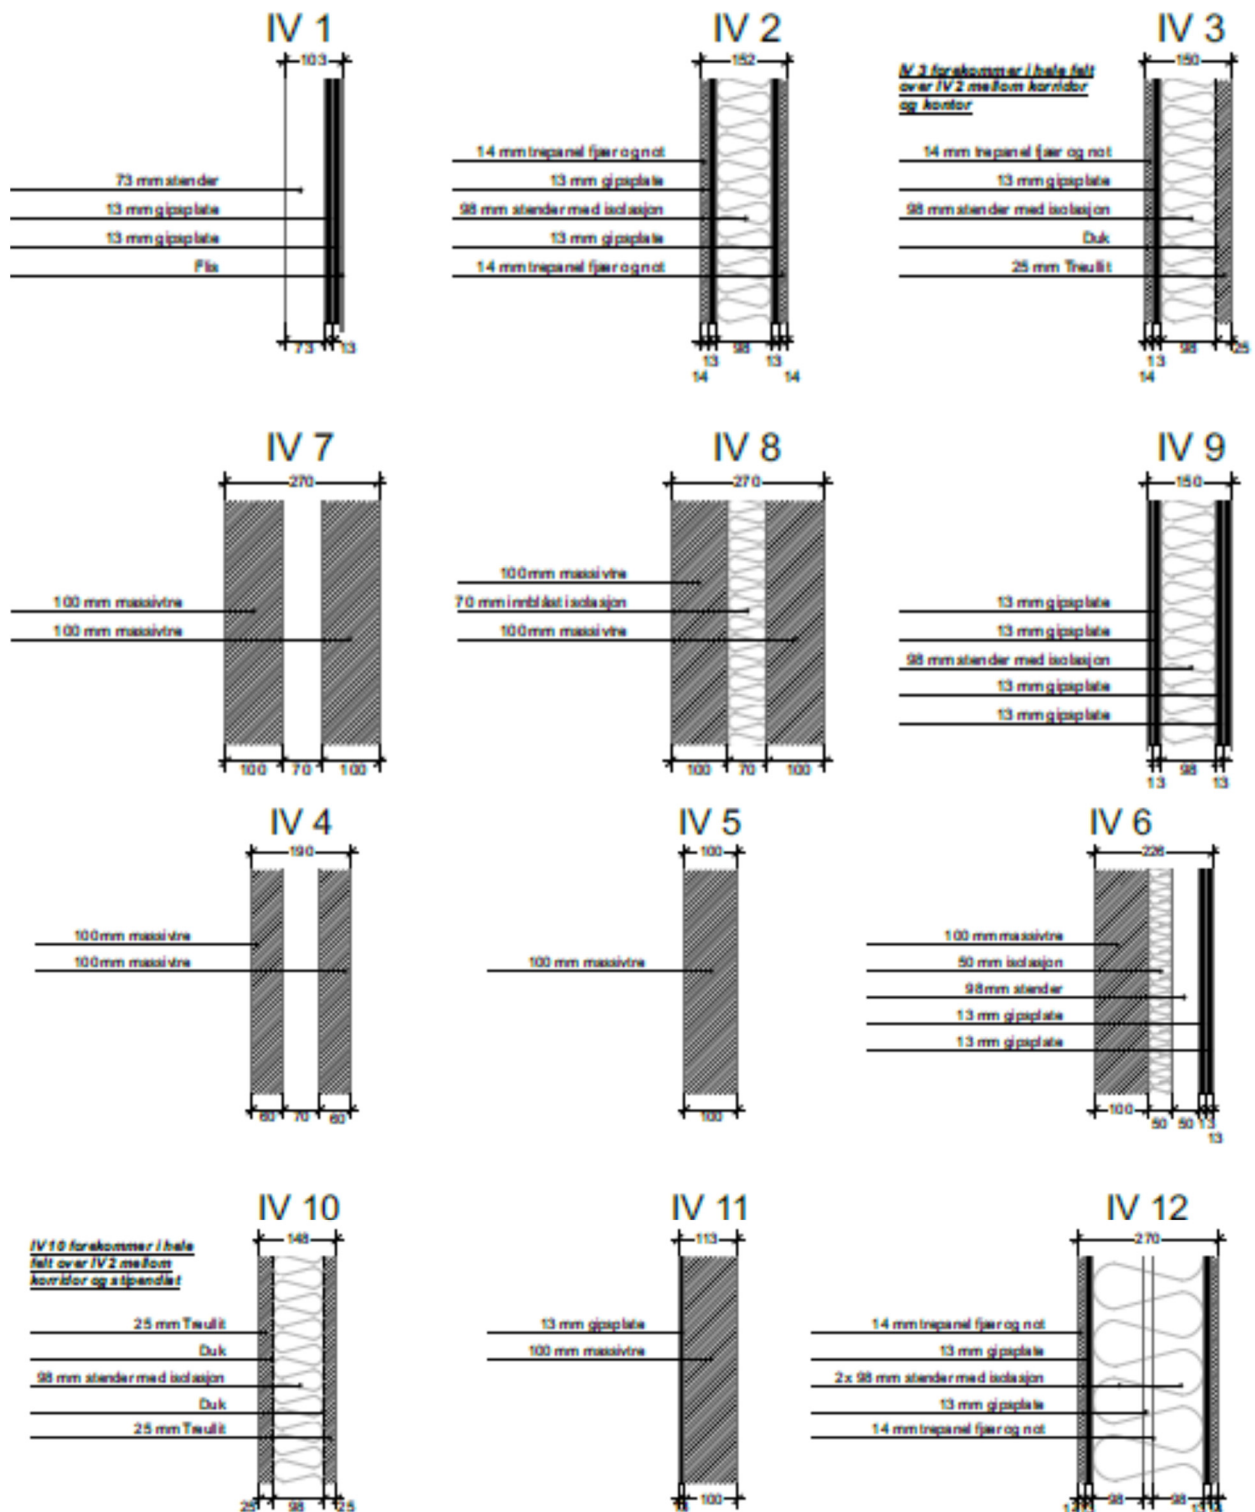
Inner wall details, courtesy of Ola Roald AS
